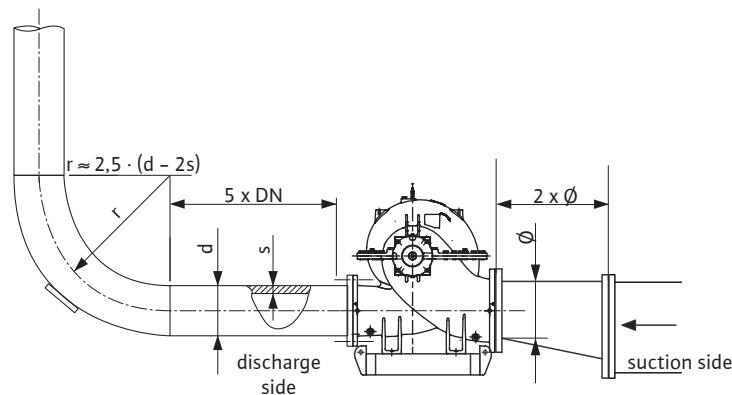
Connecting the pump without tension, settling section upstream and downstream of the pump
